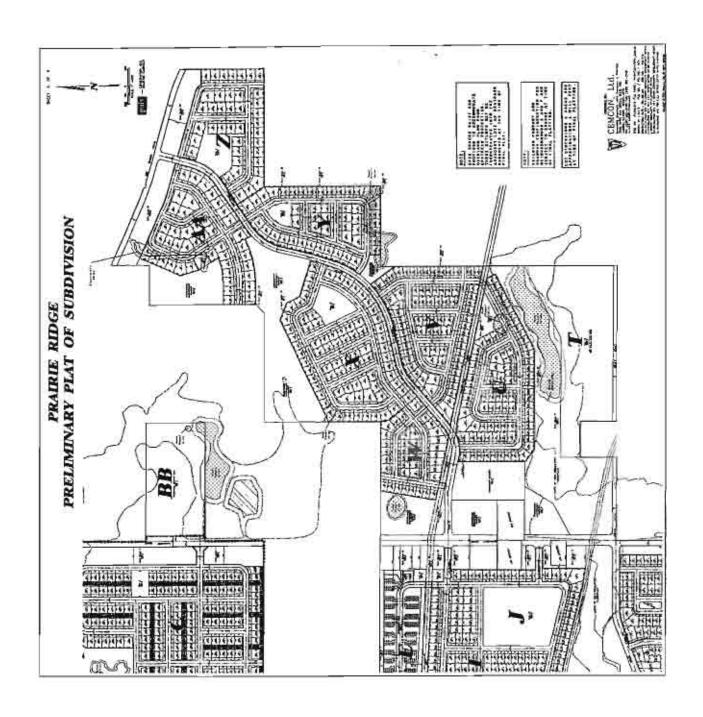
" PRAIRIE RIDGE COMMUNITY PRELIMINARY PLAN OF SUBDIVISION
